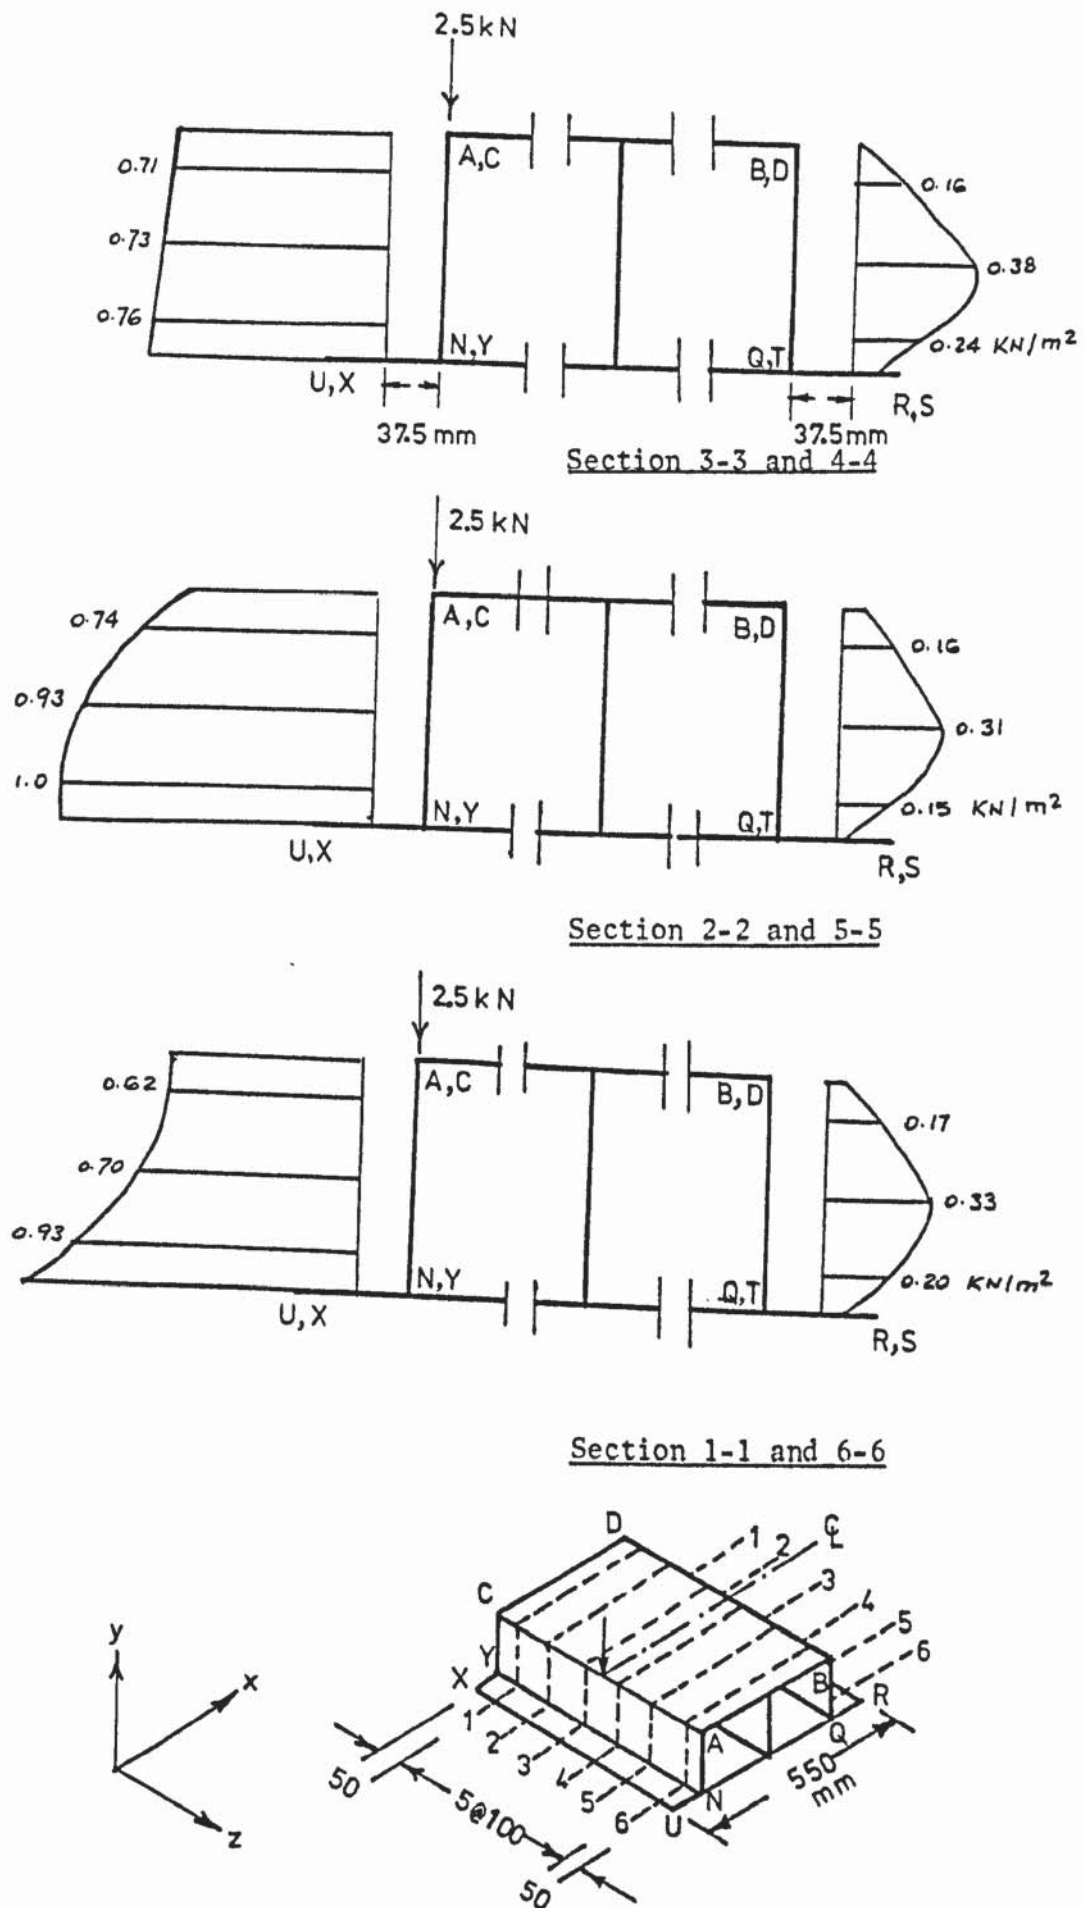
DISTRIBUTION OF HORIZONTAL STRESS σ_x ON THE WALLS OF THE CULVERT FOR LOAD CASE B4
